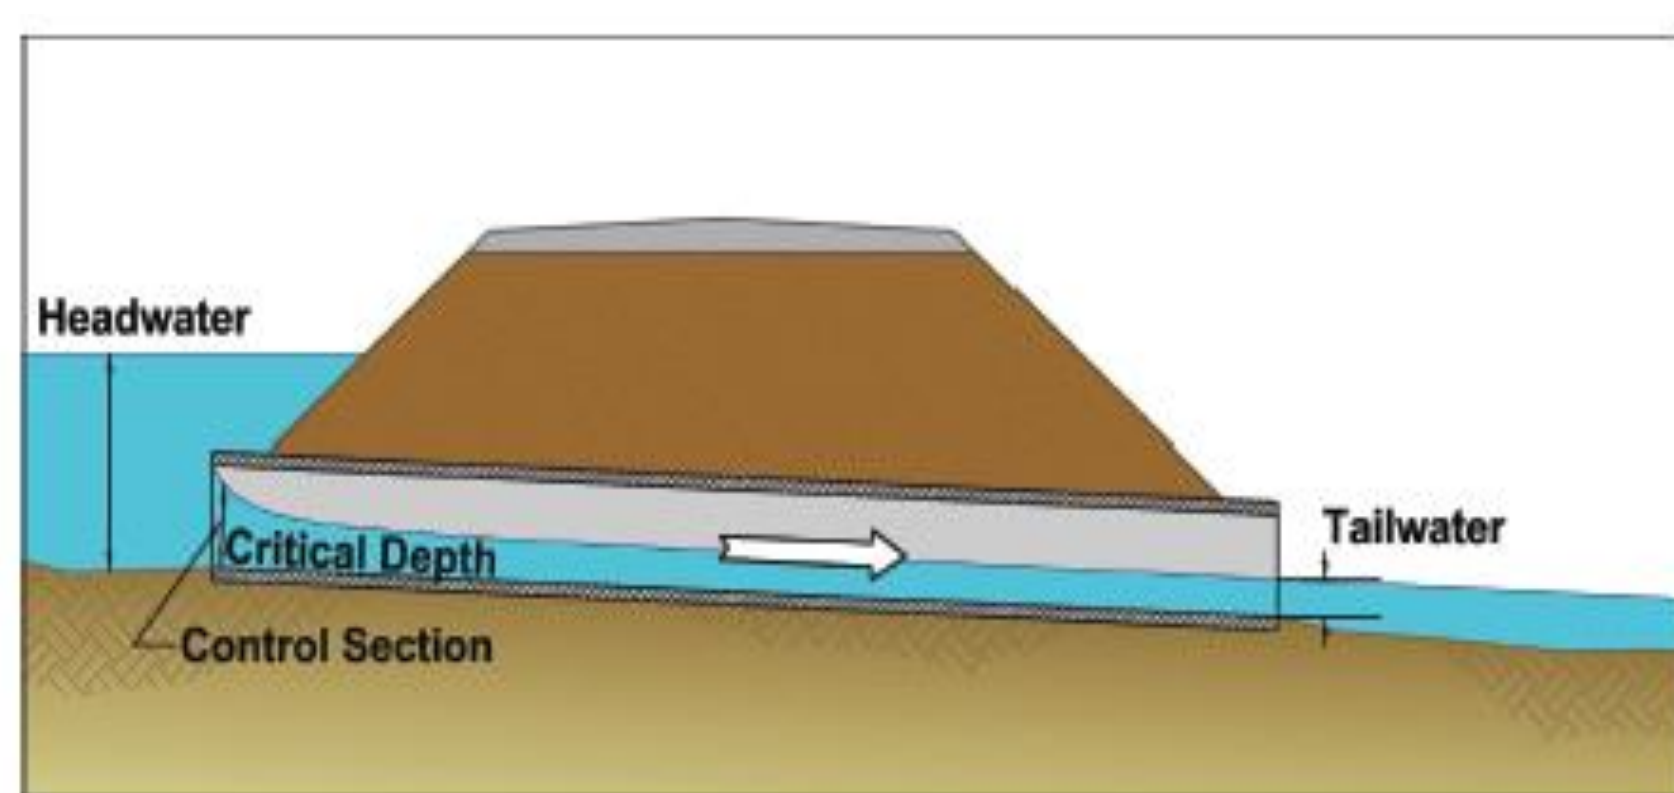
Concepts of Culvert Design (Hydraulic Design of Highway Culverts)
